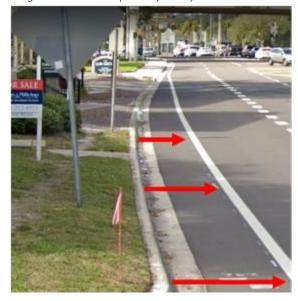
Bay to Bay Boulevard at MacDill Avenue, facing west towards Bayshore Boulevard
